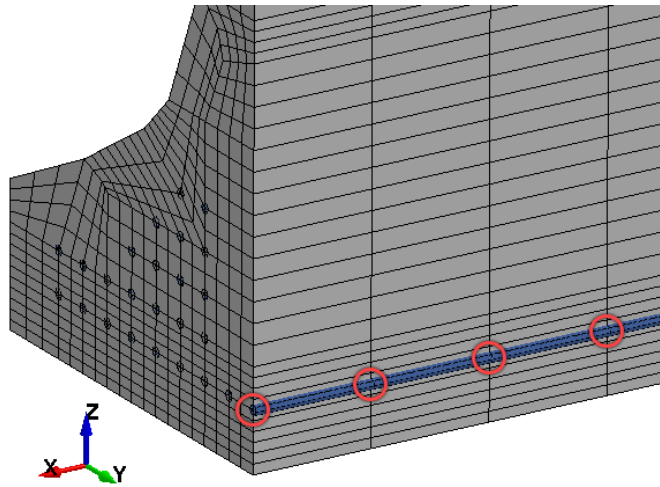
Section-cut of beam showing nodal merging between a pretensioned strand and surrounding concrete elements in the beam bottom flange
